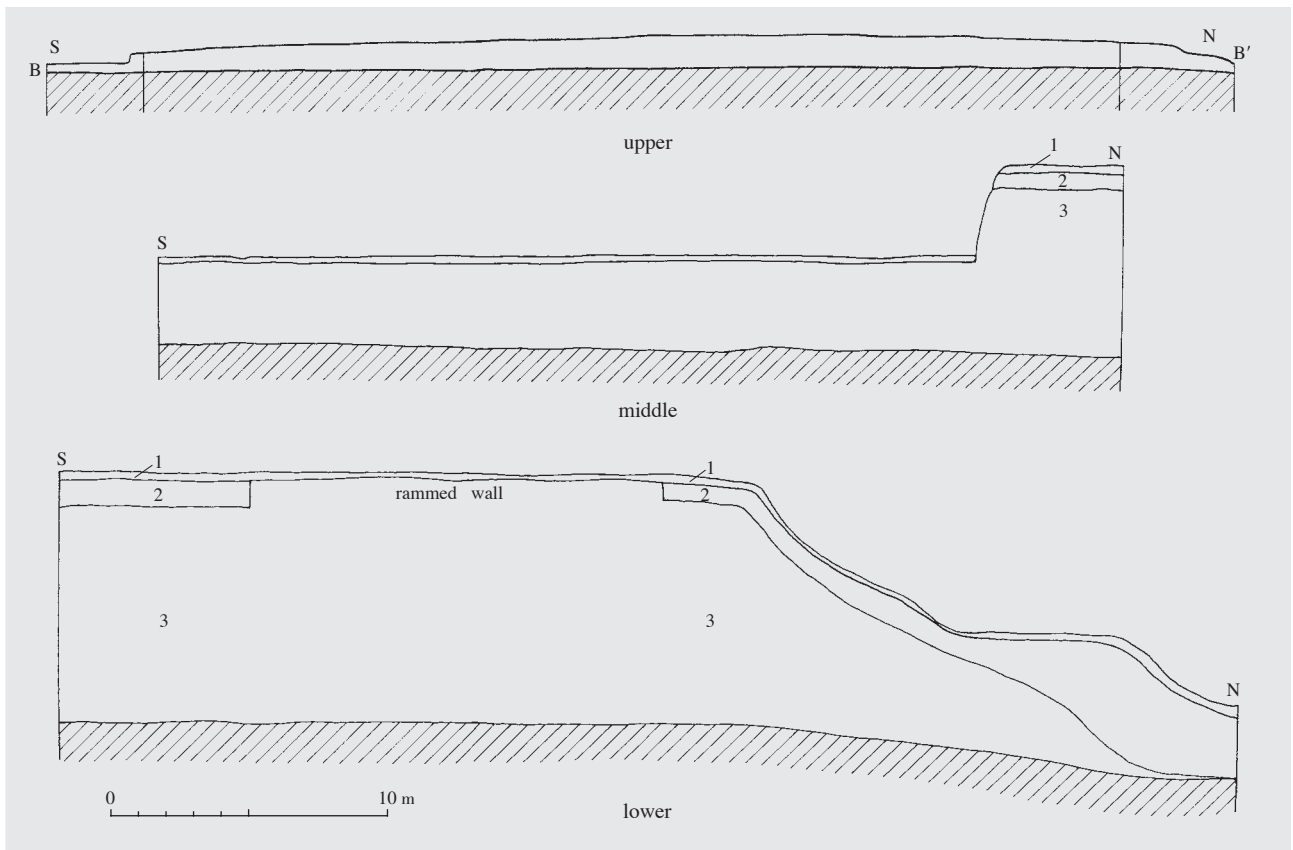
Cross-section of the front hall site of the Epanggong Palace
